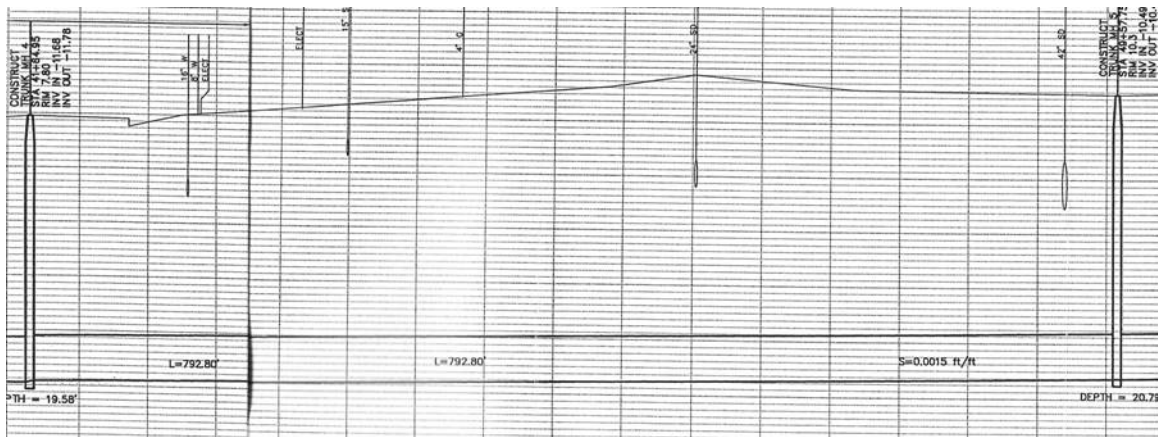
Alvarado Boulevard Trunk Sewer – Profile from Jacking Pit 4 to Reception Pit 4 (Calderwood, 2004).
